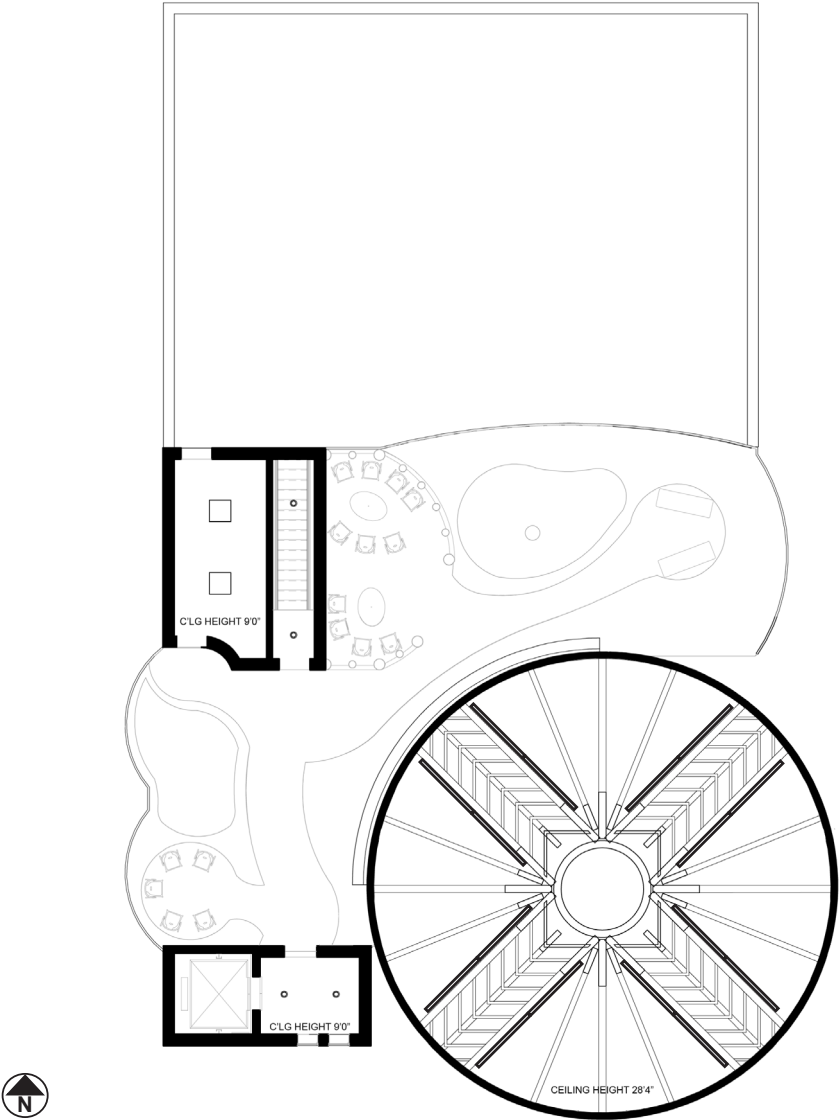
First Floor Reflected Ceiling Plan. Not to Scale.
